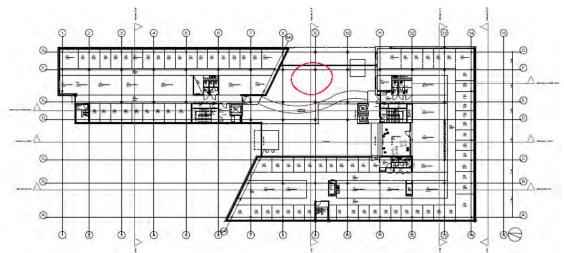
office building Prof. Brochsgt. 2 typical plan (ill. PKA Arkitekter AS)
